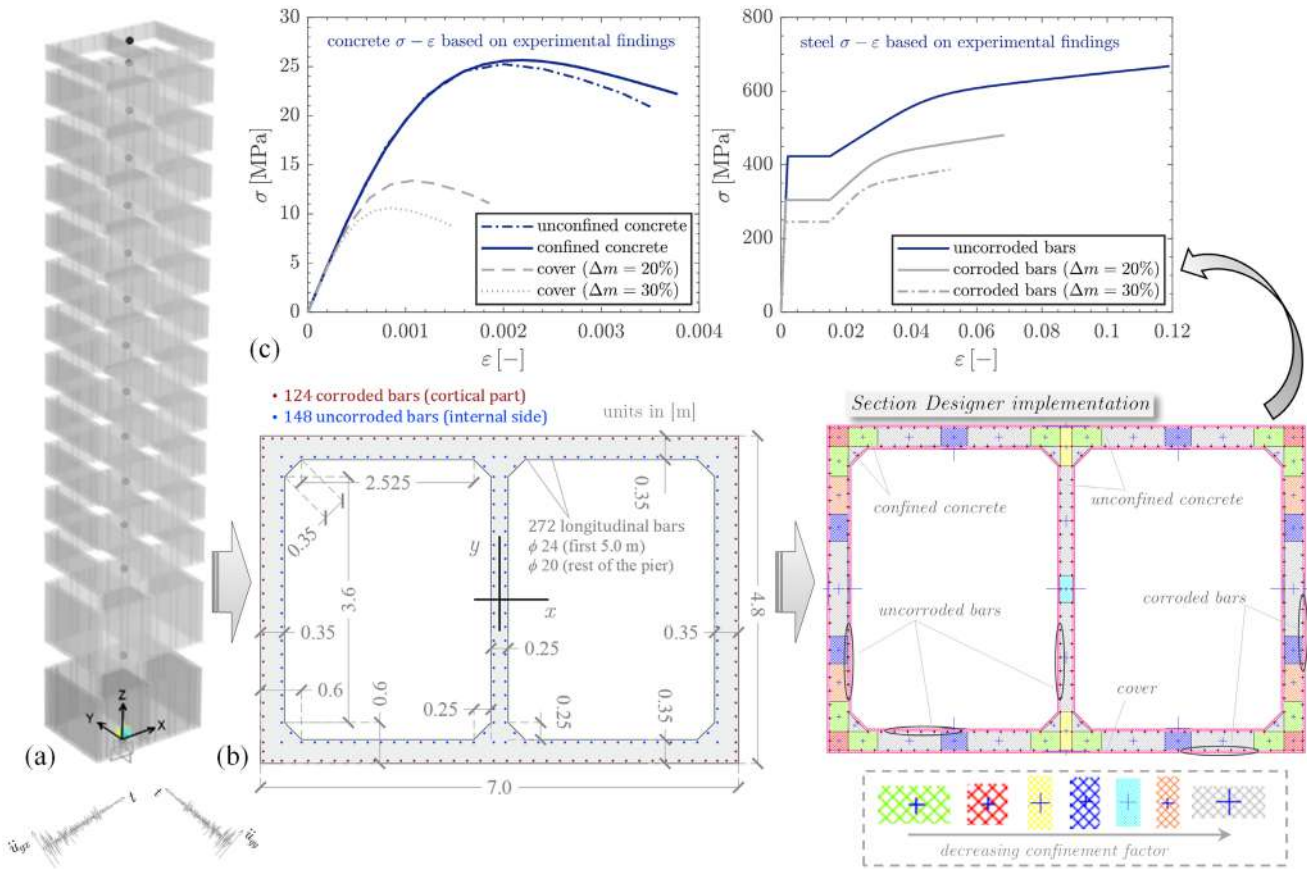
Finite element model of the reinforced concrete pier with modeling assumptions for corroded bars and concrete
